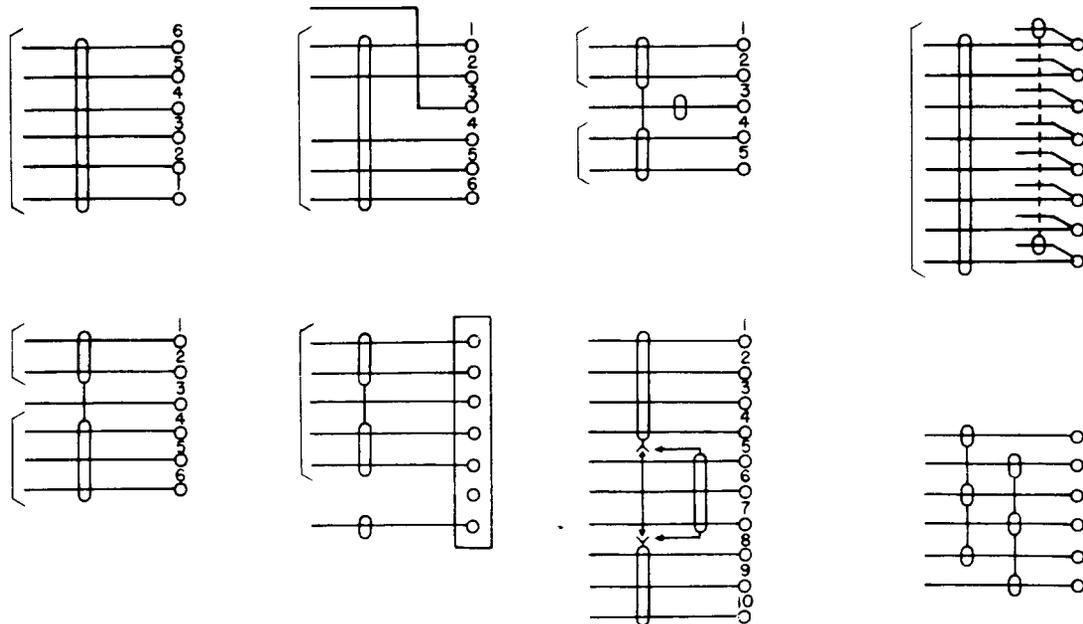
Method of Showing Cables or Wire Run on Cable Rack
